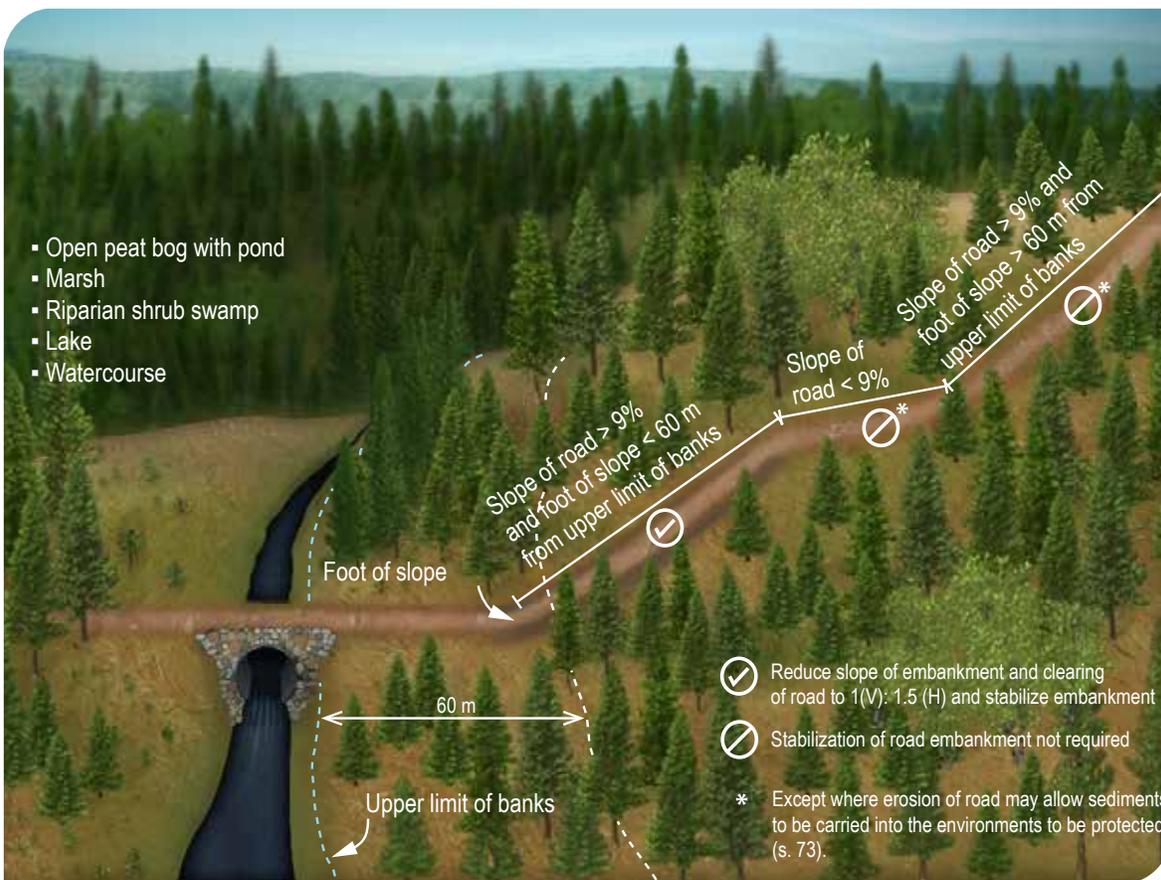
C Stabilization of the embankment of a road with a slope greater than 9%
